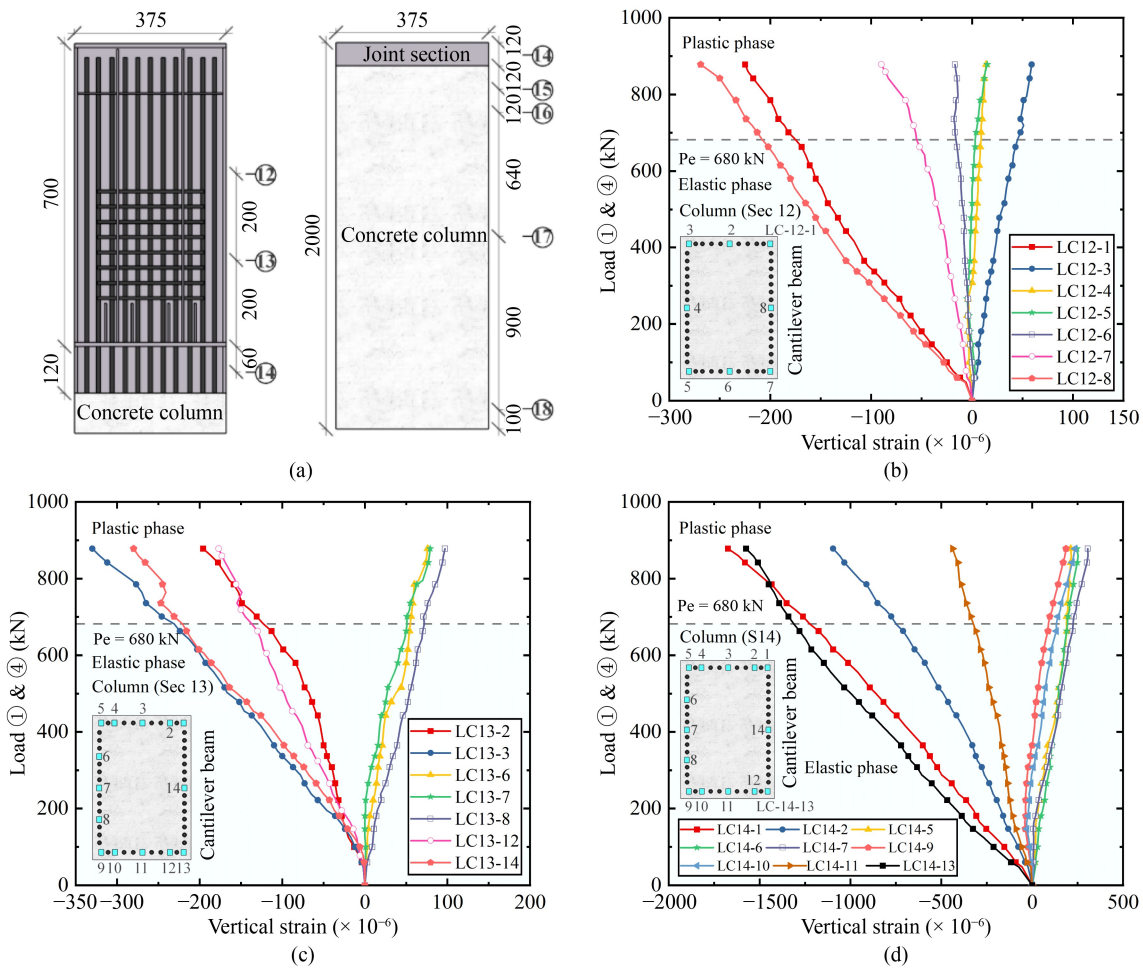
Load–strain curve of the rebar-concrete connection: (a) test sections; (b) Section 12; (c) Section 13; (d) Section 14.
